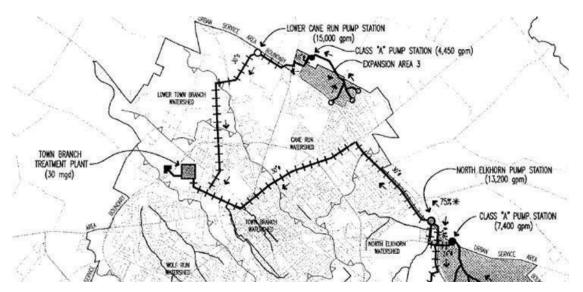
EA3 Solution from LFUCG's Facilities Plan
